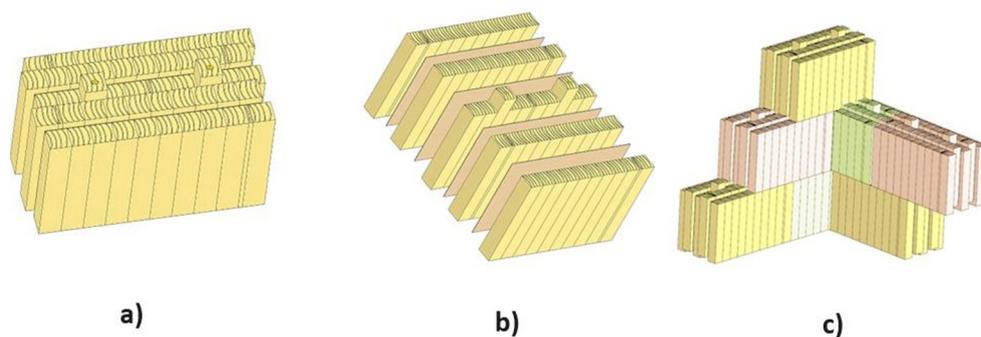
Wooden brick and a fragment of a wall structure made from it (drawing made by the authors): a) wooden brick; b) wood brick construction; c) fragment of a corner of a wall structure.
